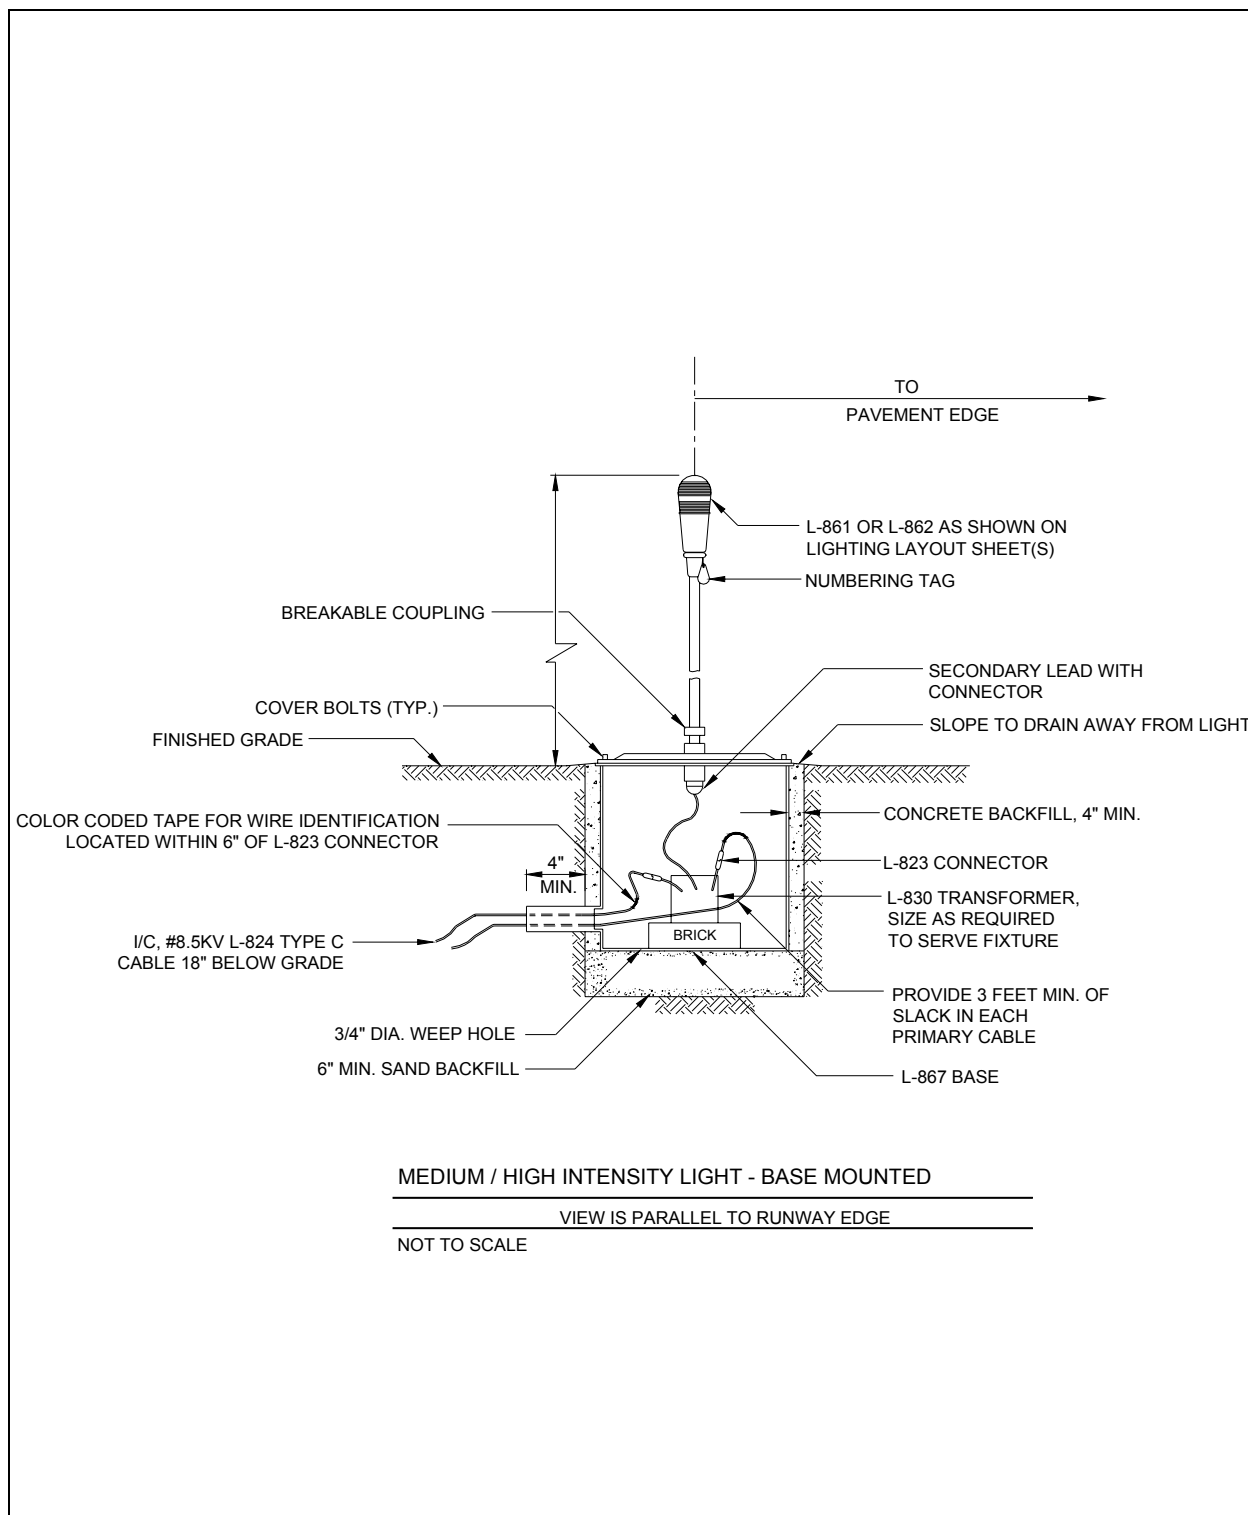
Typical Standard Details for Runway & Taxiway Edge Lights – GL-600 Sheet 1B – Medium / High Intensity Light – Base Mounted
